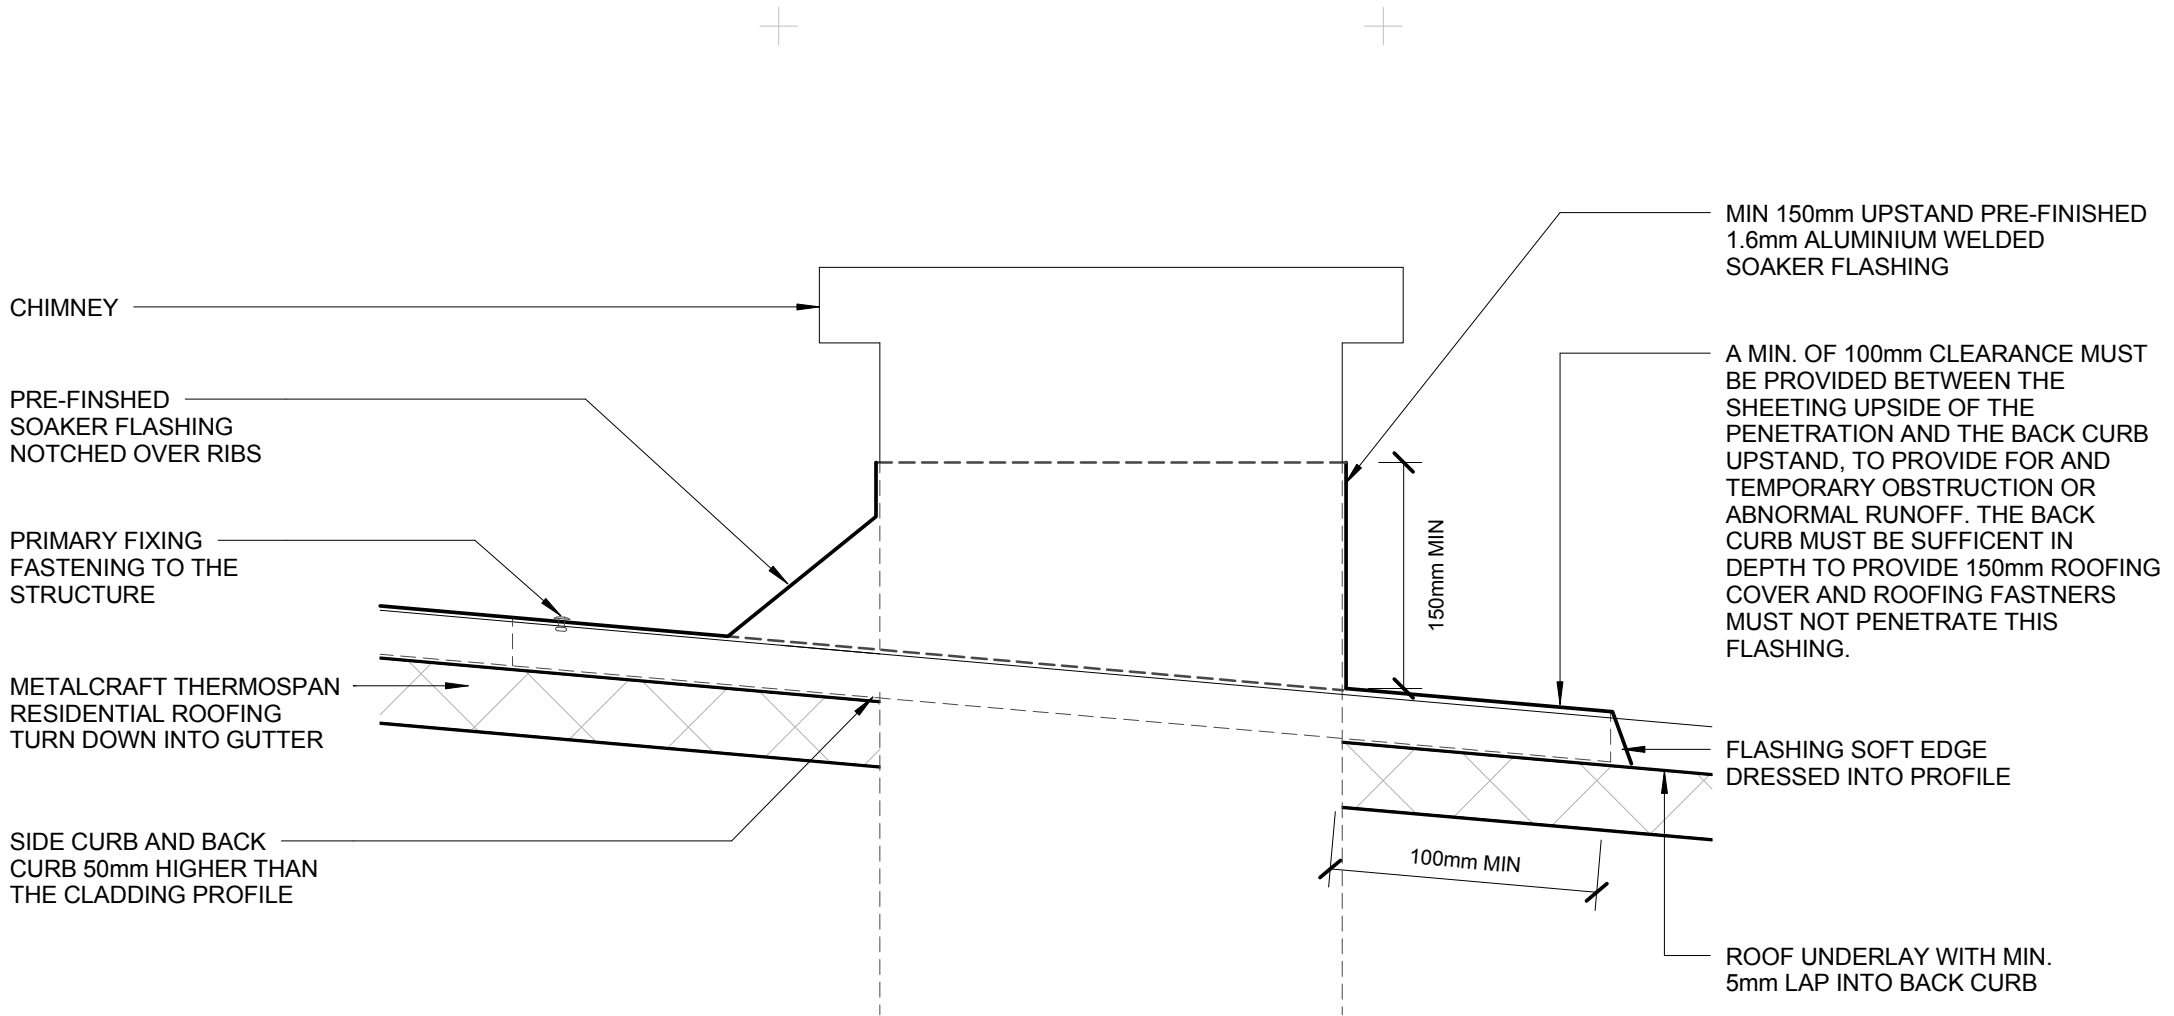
DETAIL RECOMMENDED WHERE ROOF RUNS EXCEED 16m
